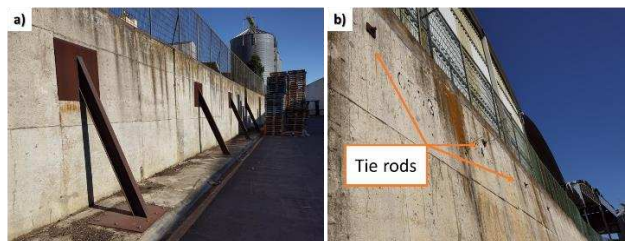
a) Steel bracing b) nailing or tie rods on the retaining wall.
